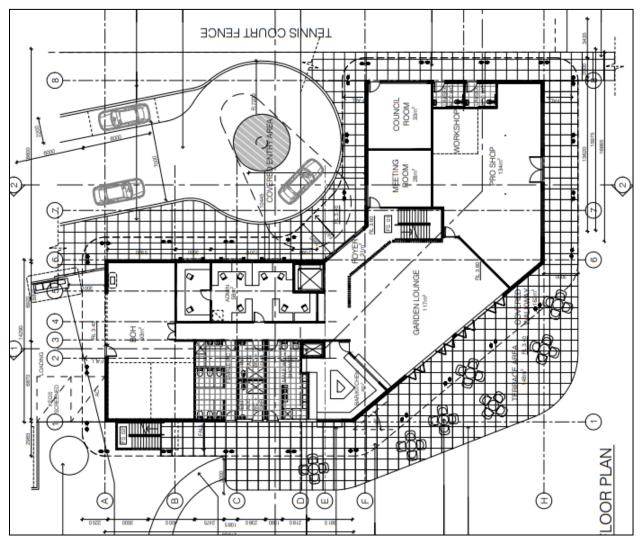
Ground Floor Plan (Source: Group Architects, 2022)
